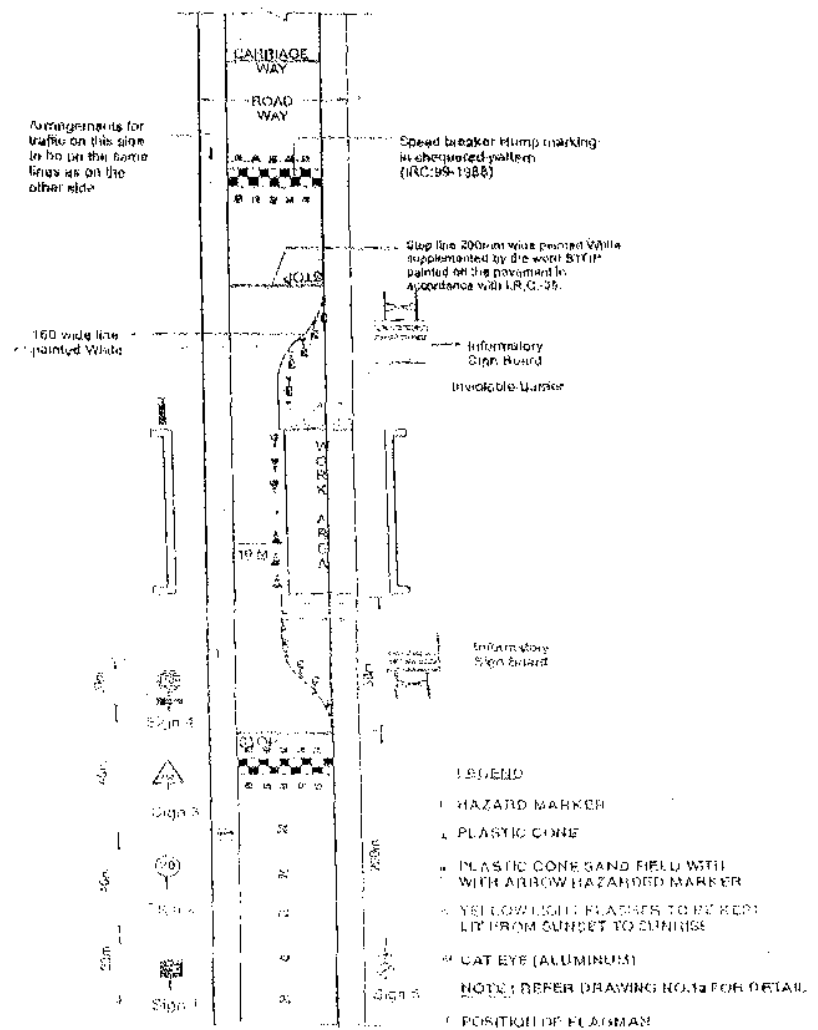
Arrangement During Reconstruction of Cross Drainage Structures where Traffics can be Passed Over Part Width
